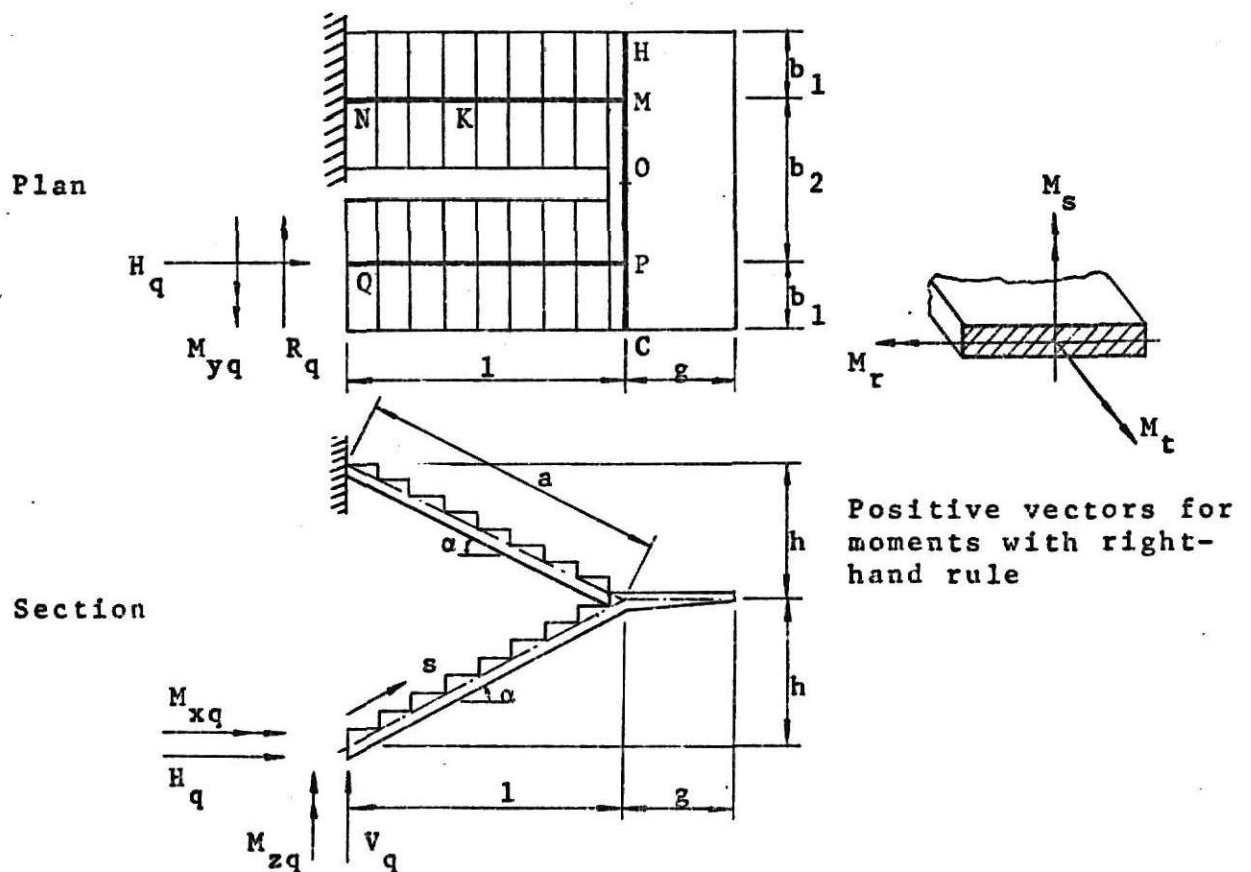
Plan, Section and Sign conventions for moments of the staircase
